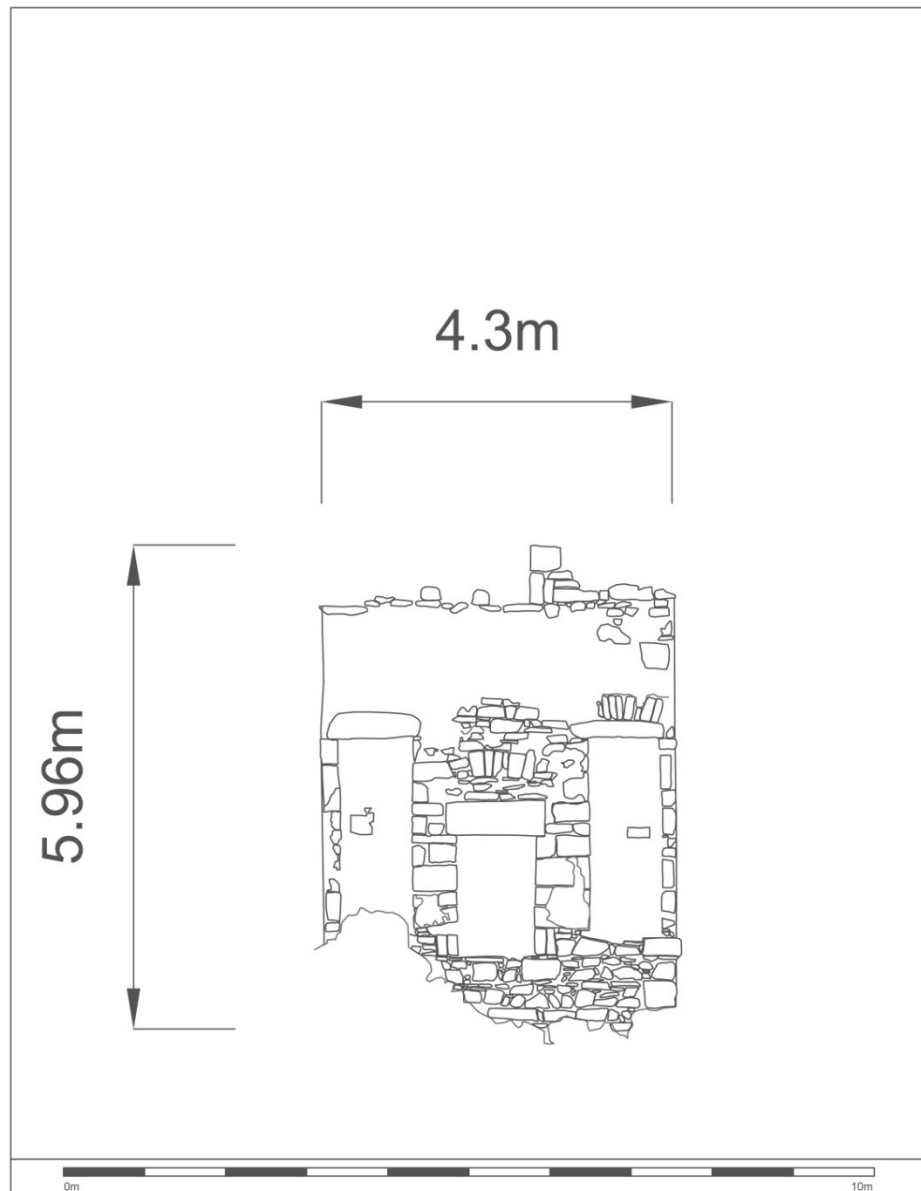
Internal elevation of the east wall of Clare Island Signal Tower.
